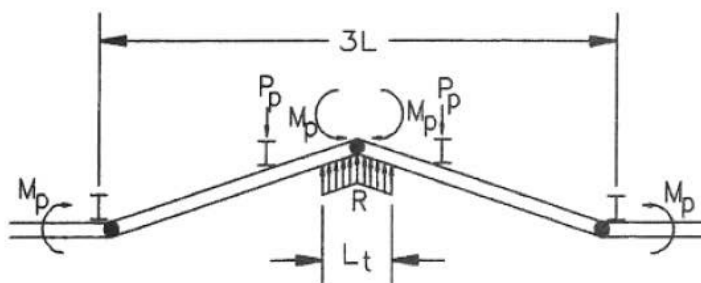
Three-Span Failure Mode for Post-and-Beam Railings
